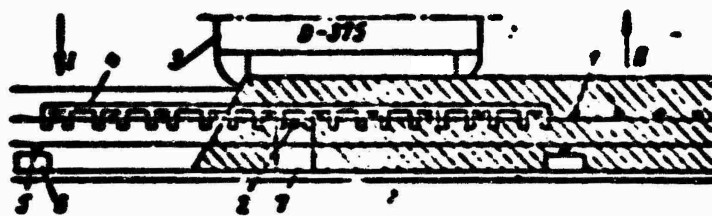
Scheme of placing reinforcement bars and movable guiding molds when using the D-375 concrete placing machine. 1) Reinforcement bars on the top layer of the reinforcement wires; 2) reinforcement bar supporting the upper layer of wires; 3) concrete placer; 4) movable guiding mold; 5) reinforcement bar supporting the lower layer of wires; 6) and 7) concrete support; I) placing of reinforcement bars and movable guiding molds; II) removing the movable guiding molds.
